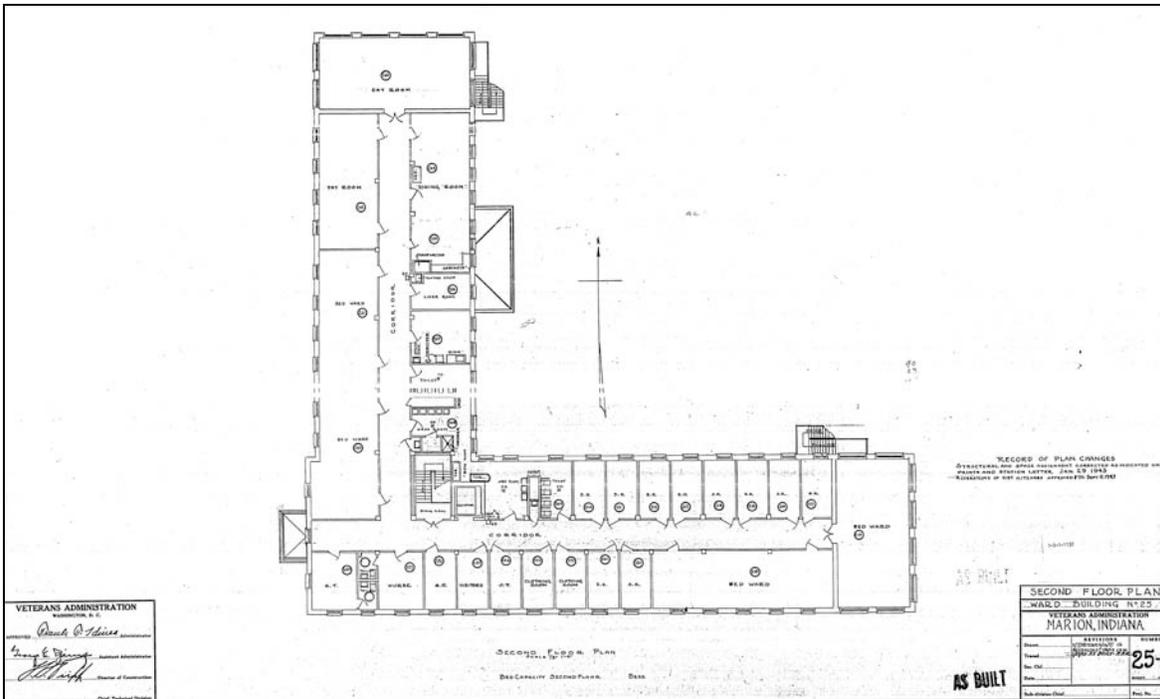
Second Floor Plan, Building No. 25, c. 1943
